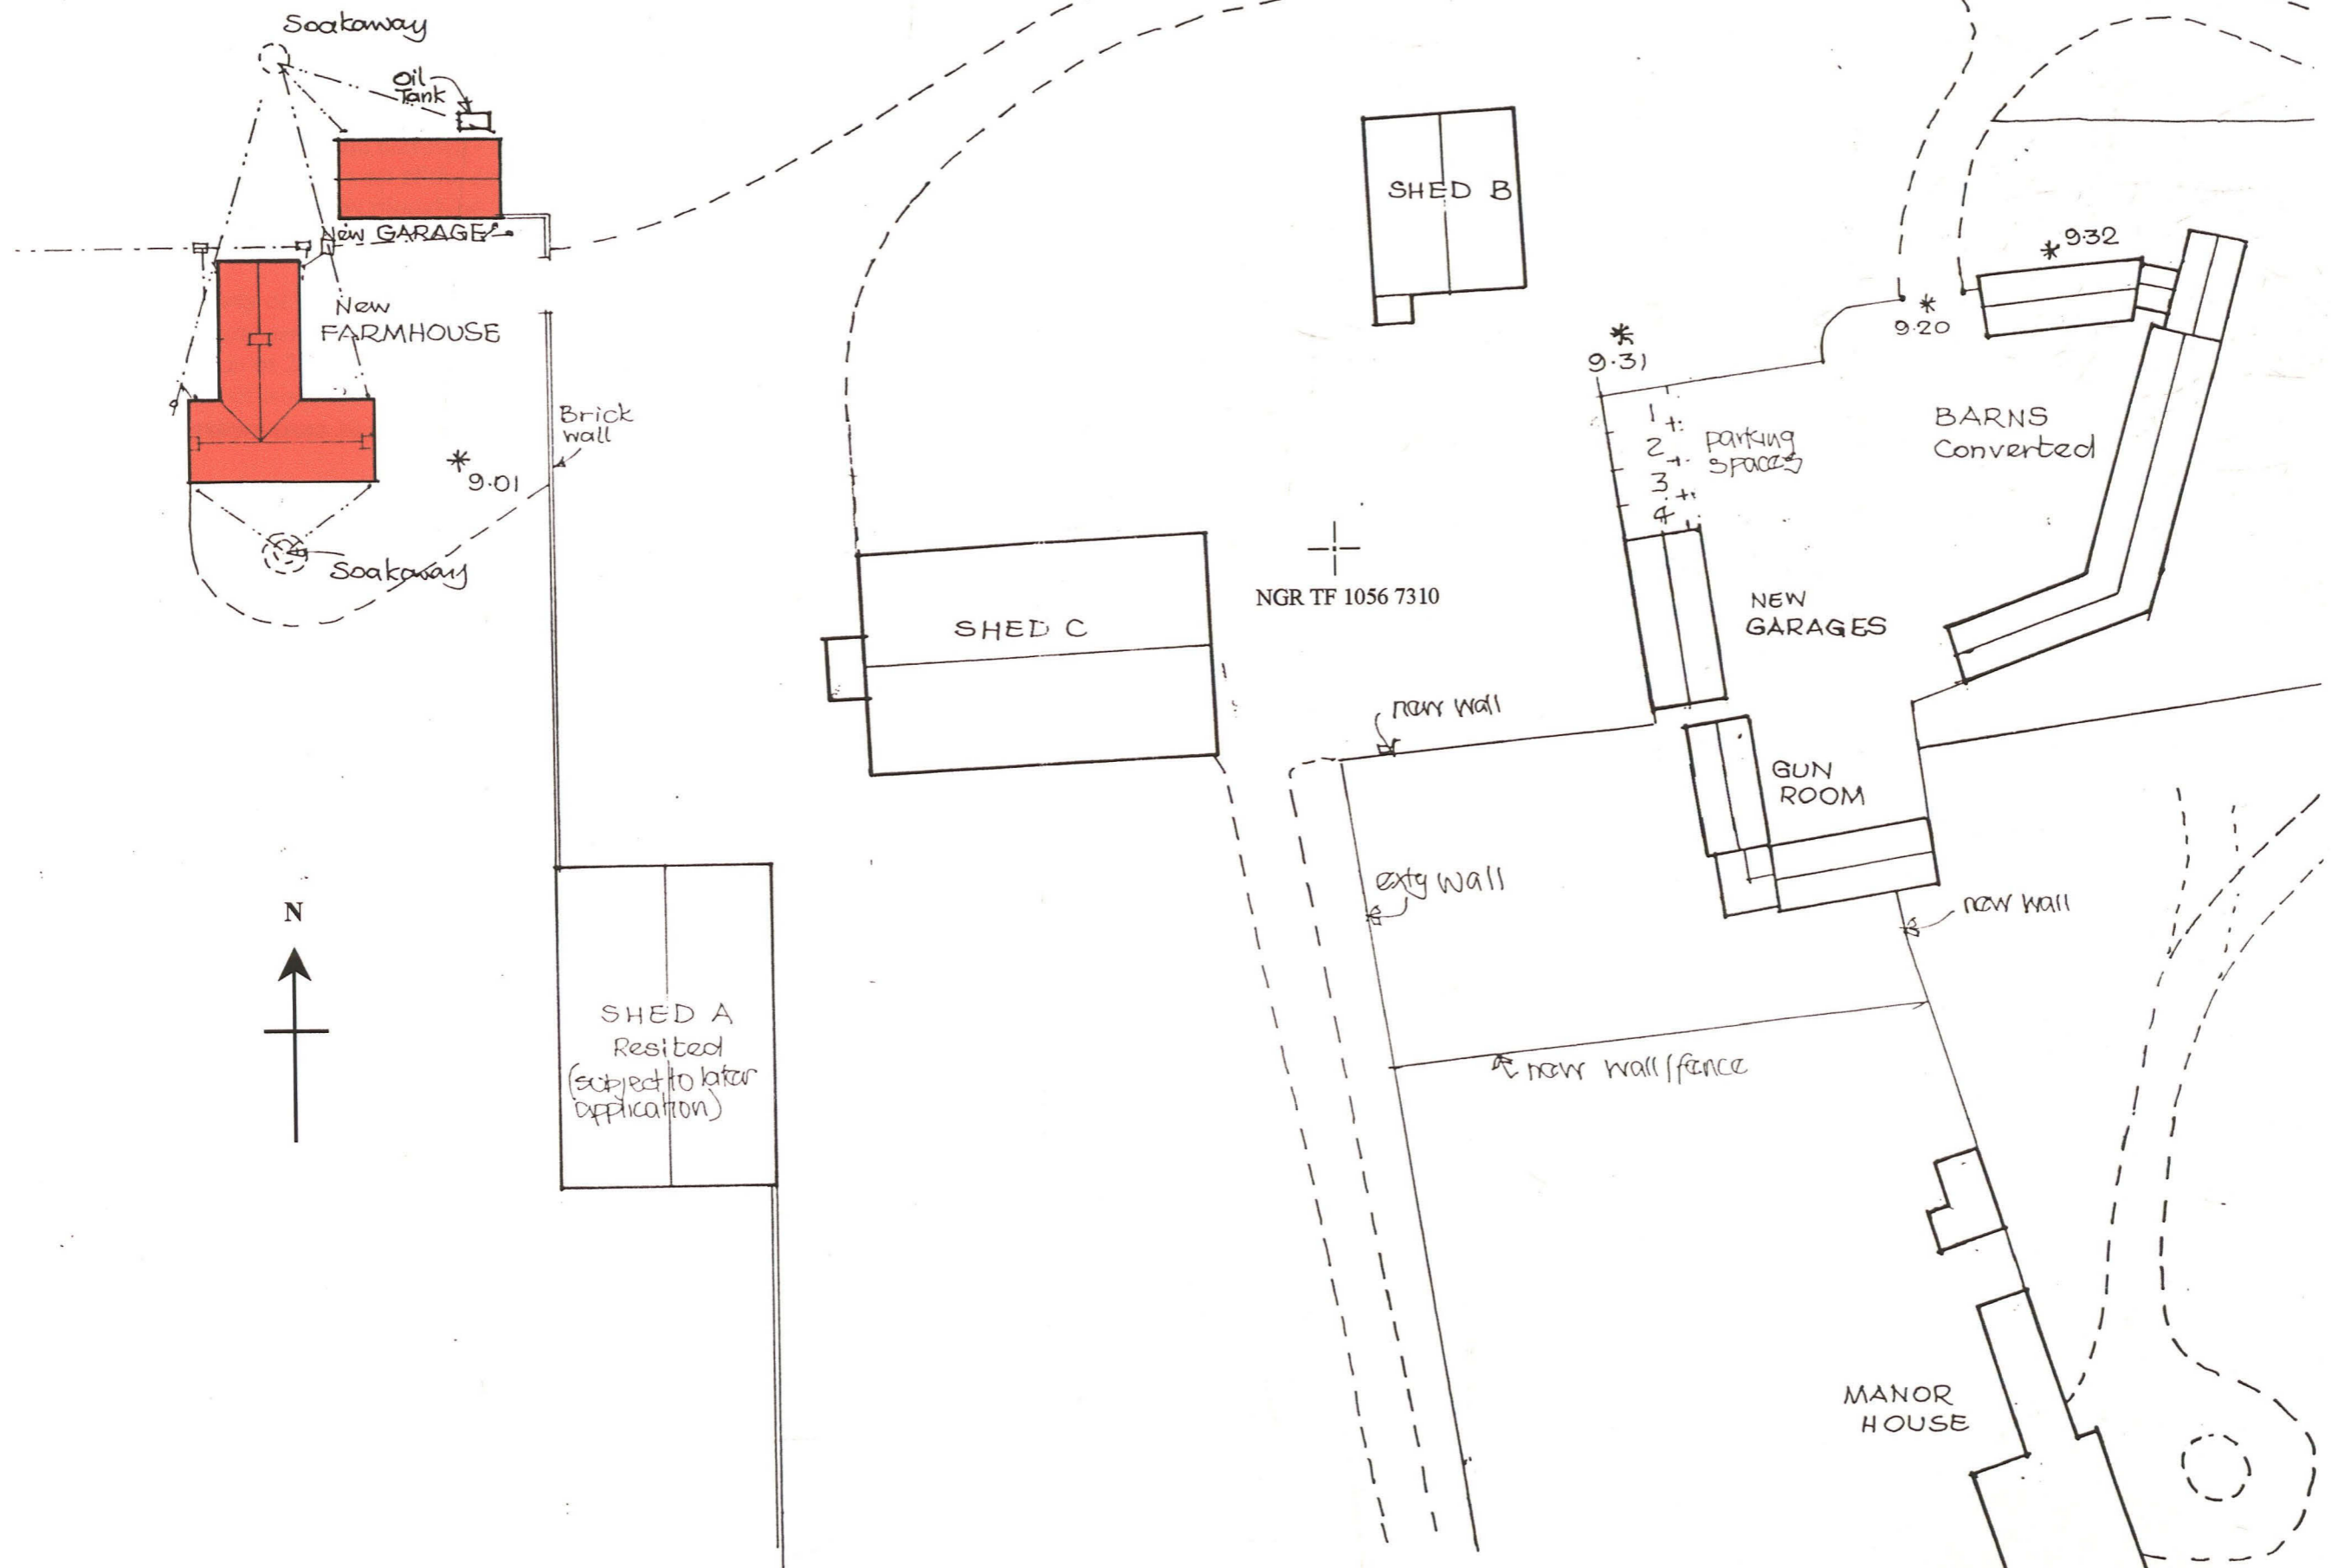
Location plan of the proposed new buildings within Manor Farm (shown in red). Scale 1:500.
